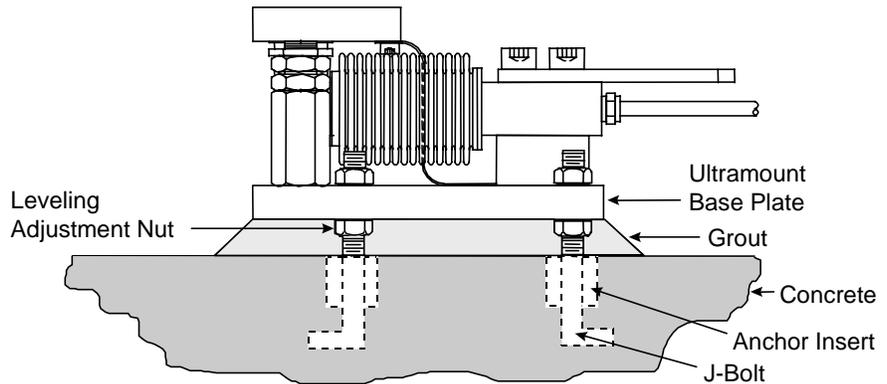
Base Plate Bolted to Unevel Concrete Floor
